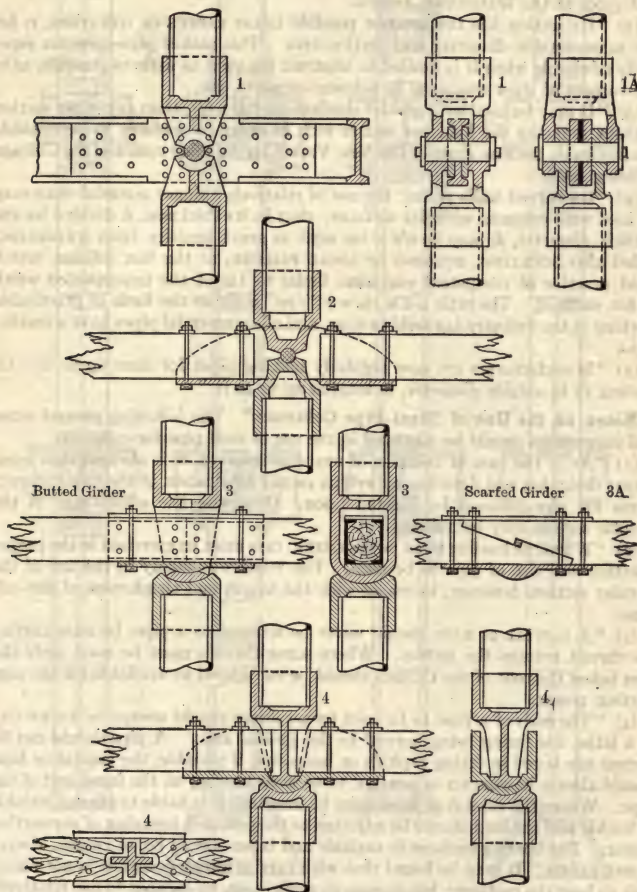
Connections, Caps and Bases for Steel-pipe Columns
